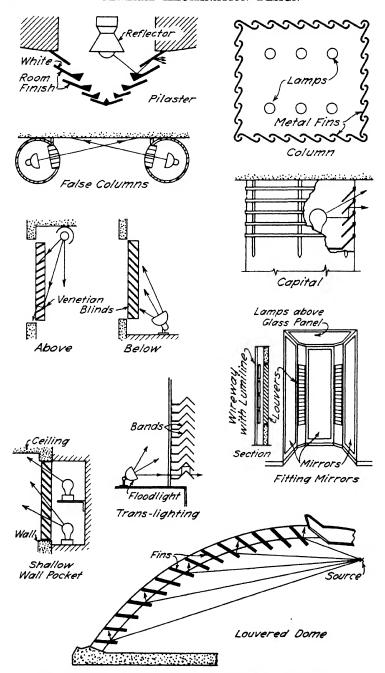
Louvers in columns, pilasters, and architectural elements.
